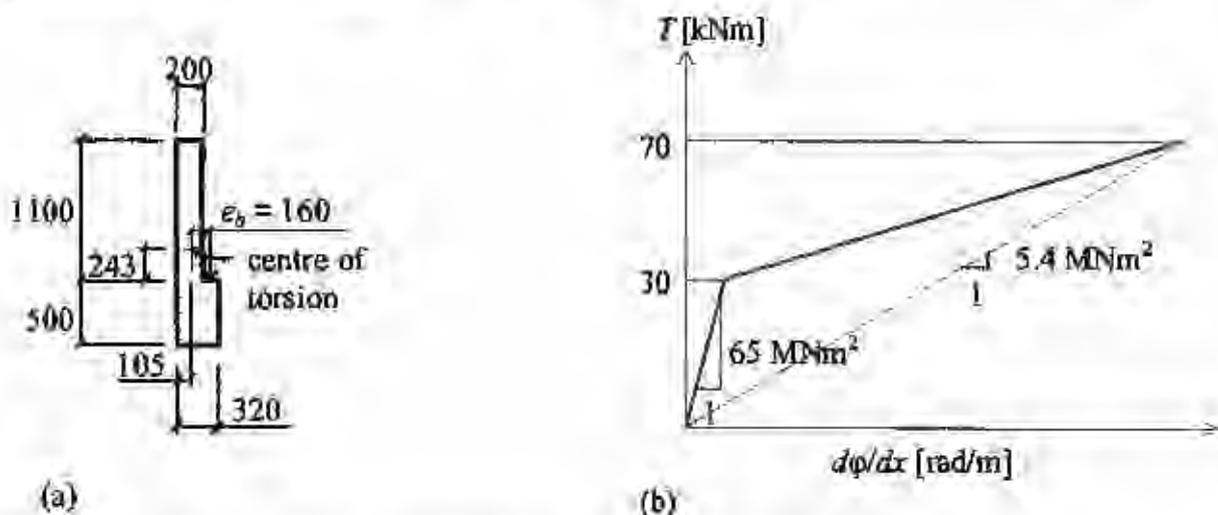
(a) Cross-section of the spandrel beams; (b) Assumed torsional response of the spandrel beams loaded in torsion, bending and shear.
